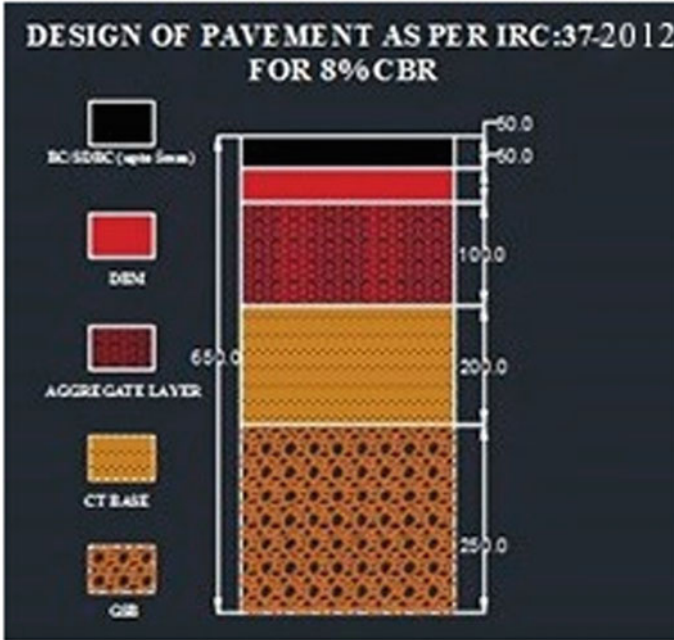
Design of pavement Cross-section 5 as per IRC:37-2012 for 8% CBR in mm
